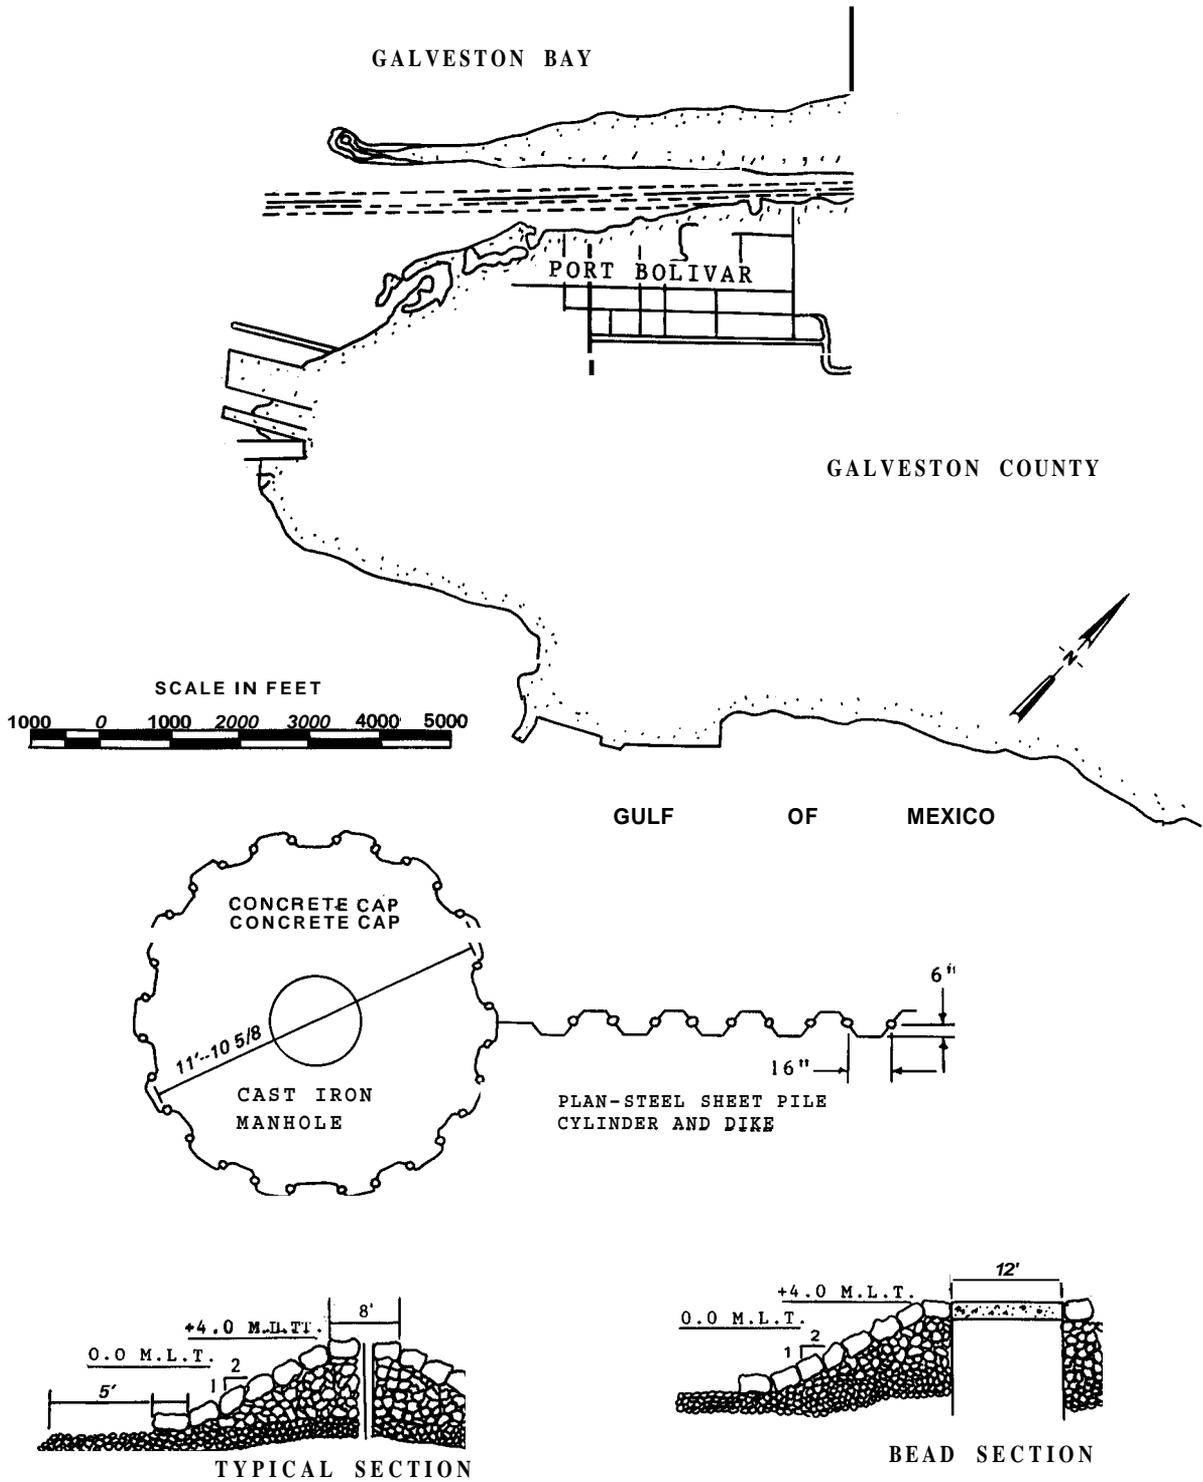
Location, plan view, and typical sections of Port Bolivar jetty
